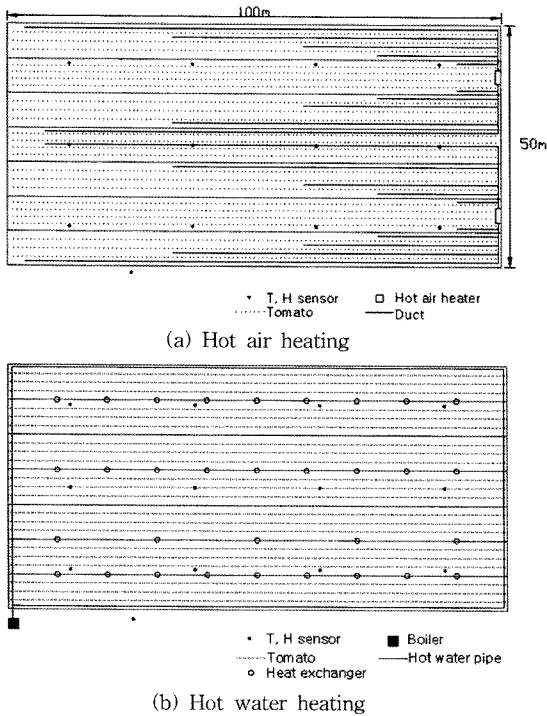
Plan view and sensor layout of experimental multi-span greenhouse.
